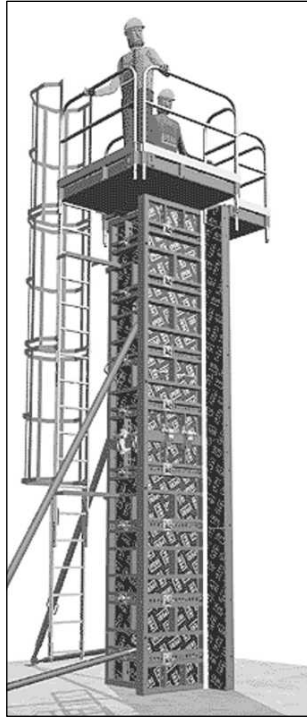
Typical Trio Column Formwork (Courtesy PERI).
